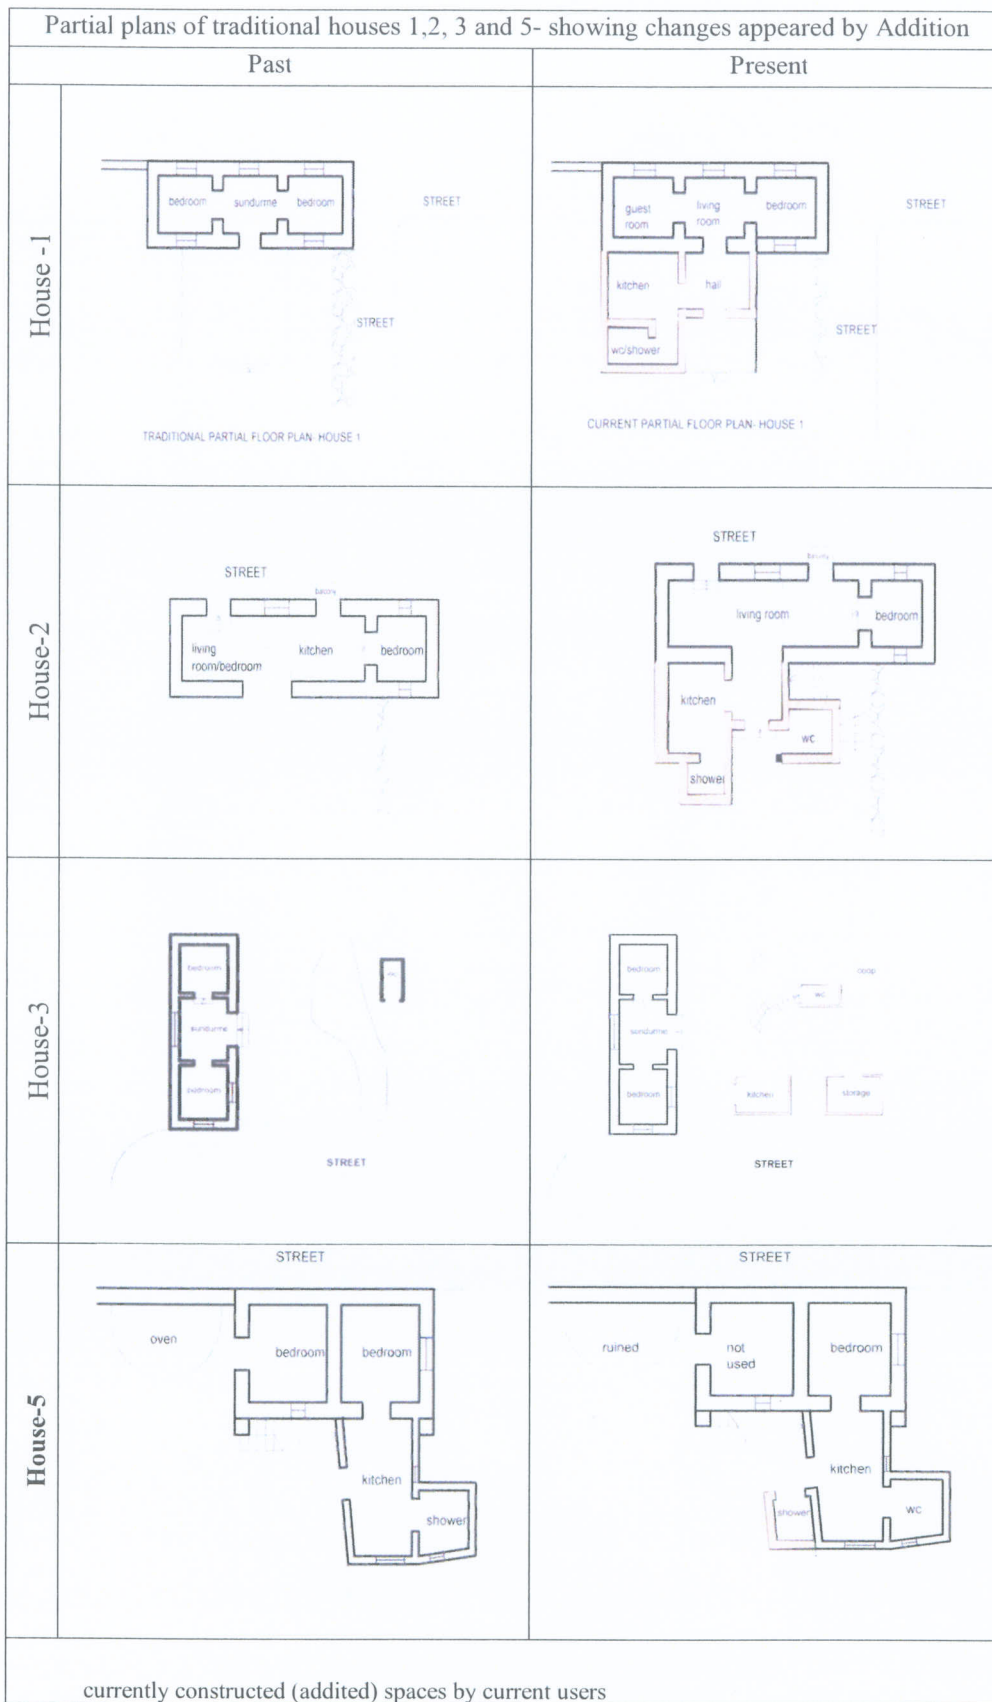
Partial plans of traditional houses 1, 2, 3 and 5 showing changes appeared by addition (Author,2012)
